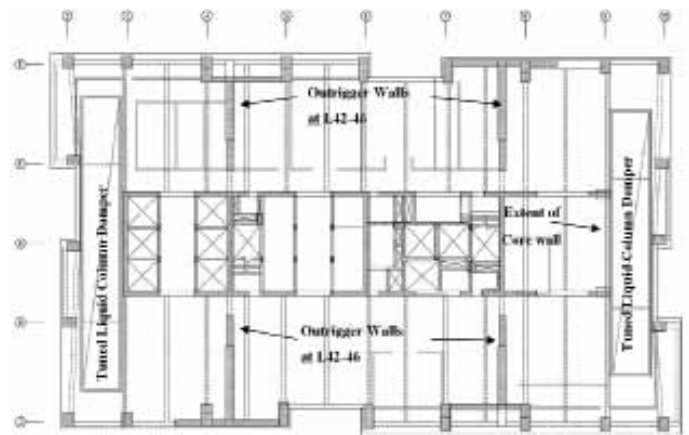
Floor Structure Plan at Outrigger & TLCD's
